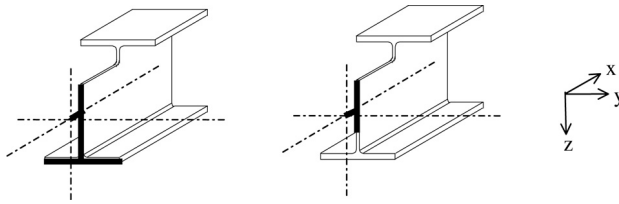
Long end plate (left-hand panel) and short end plate (right-hand panel).
